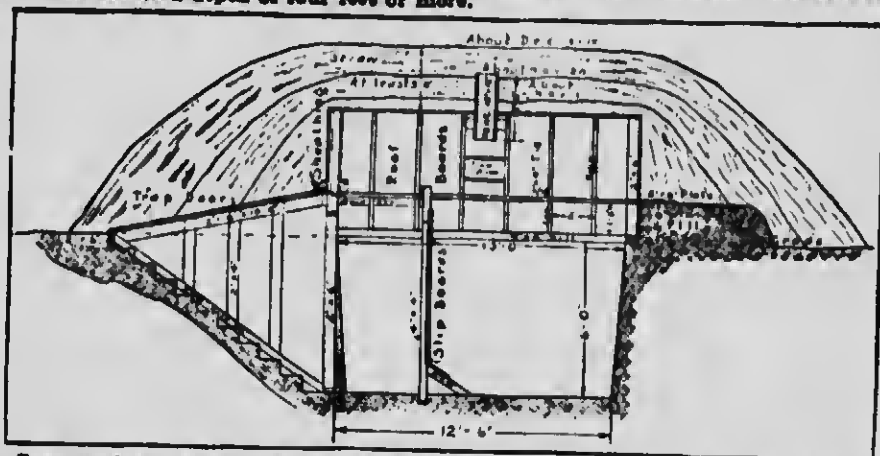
Cross section (side view) showing method of construction in an Outside Potato Cellar with entrance and stairs.
